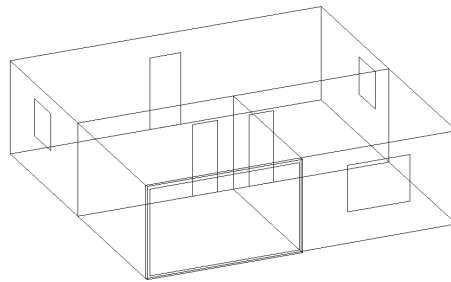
Collecting and accumulating wall in south-west zone of the simulated building
